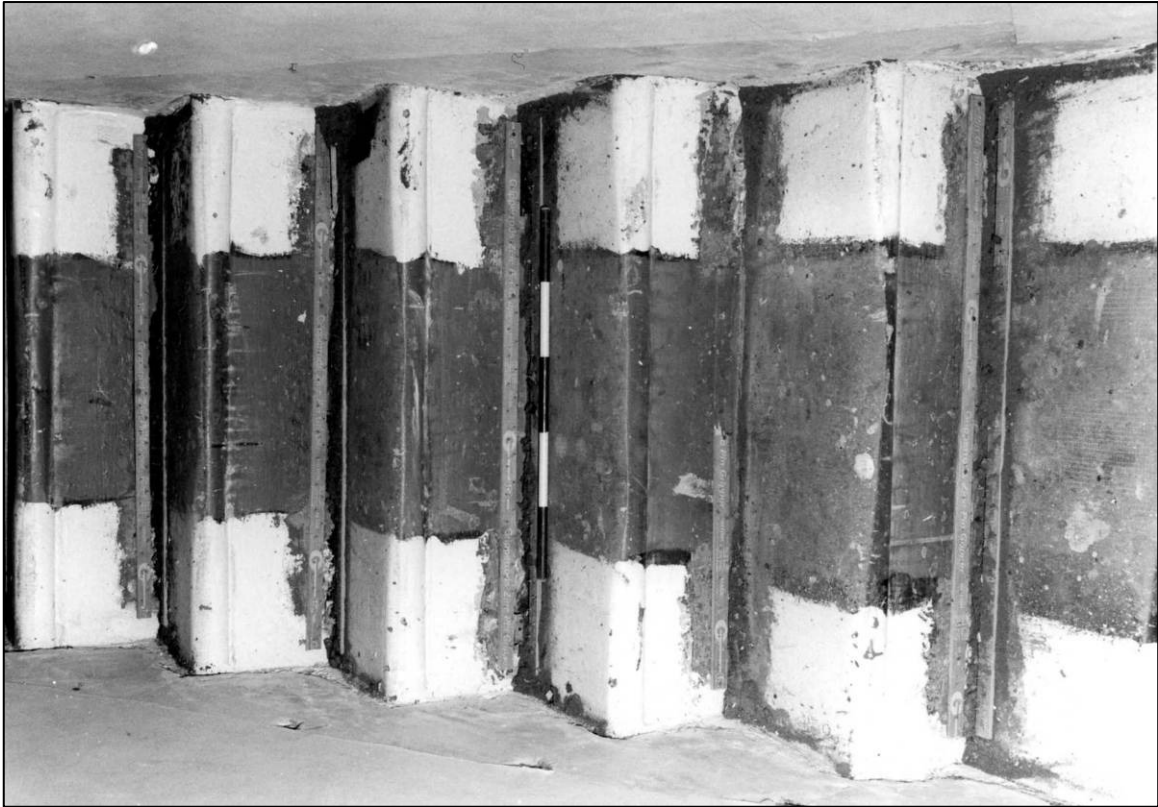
Barn Cottage range, N part, stairs, looking W (photo 11/13) (top to left).
